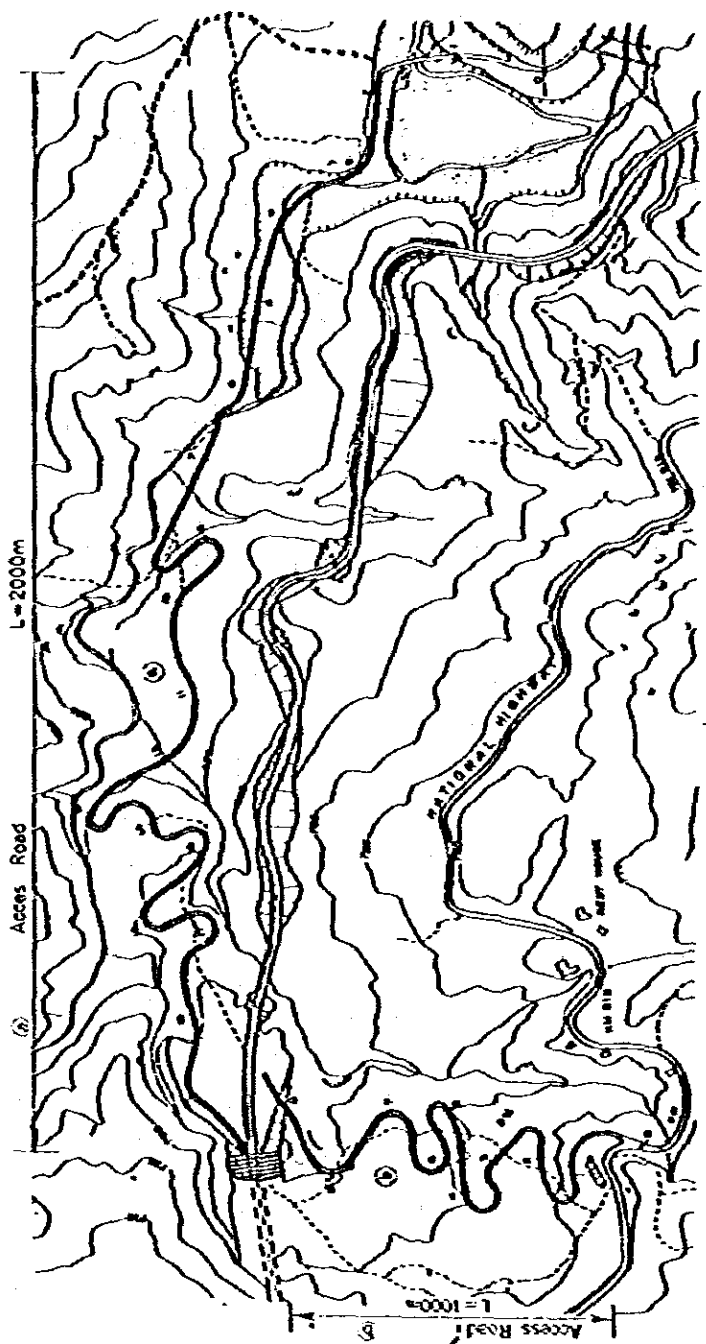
ACCESS ROAD FOR TUNNEL CONSTRUCTION (Sta Fo Side)
